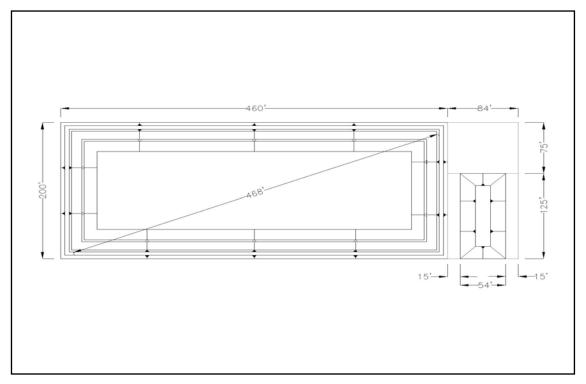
Alternative 3 - Permanent berm with geotextile and temporary excess dredged material stockpile on the North dewatering site.
